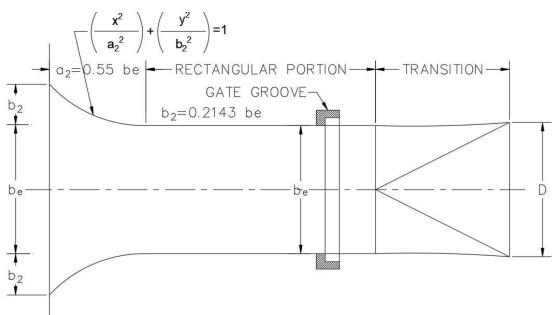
DETAIL OF (SIDE FLARING) ENTRY IN PLAN
